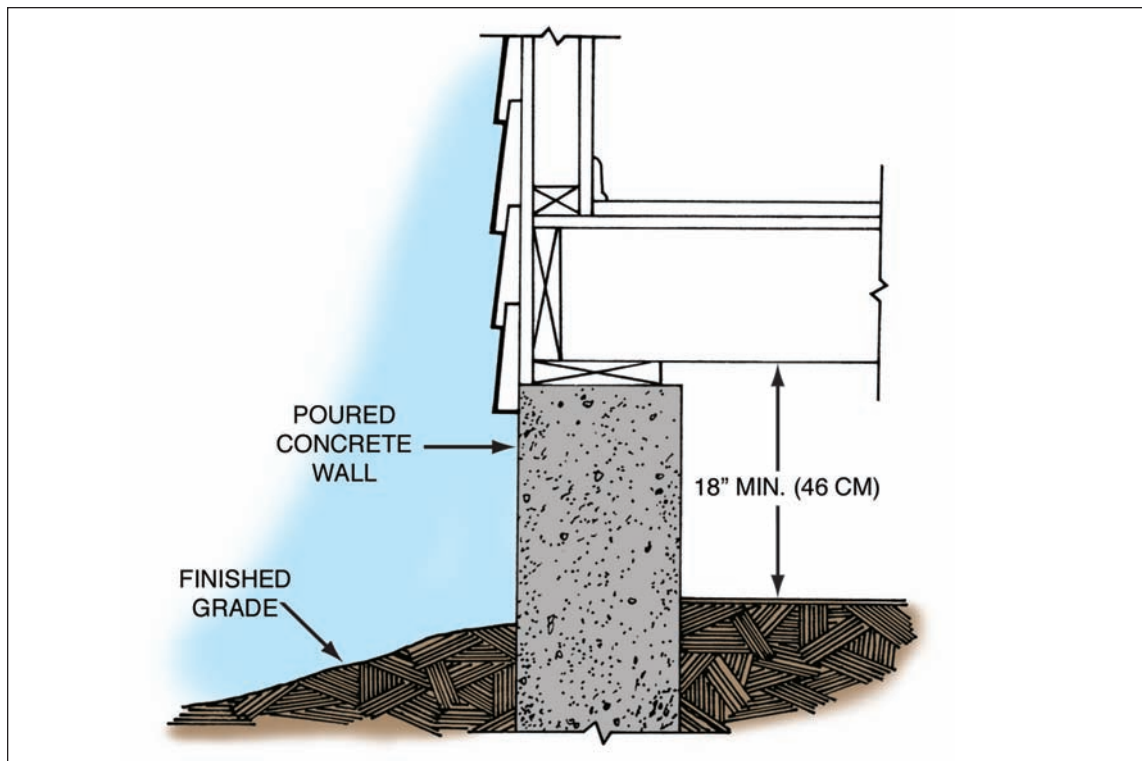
Poured concrete walls and piers are easily inspected for hidden termite infestations.
